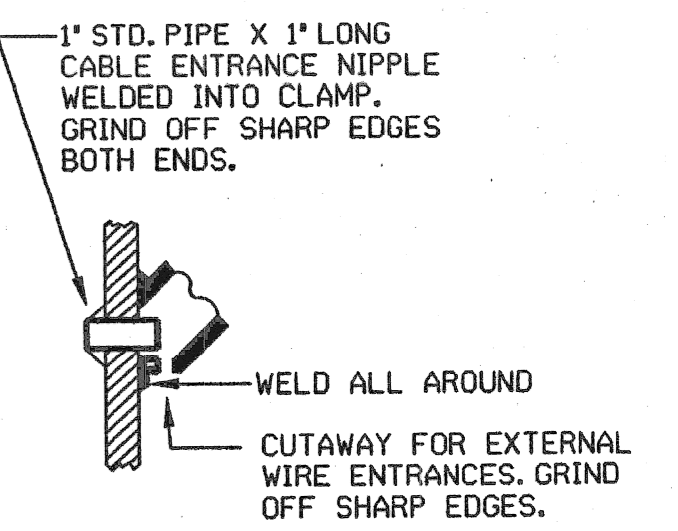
DETAIL OF INSTALLING CONDUITS IN & OUT OF NEW FDN.
